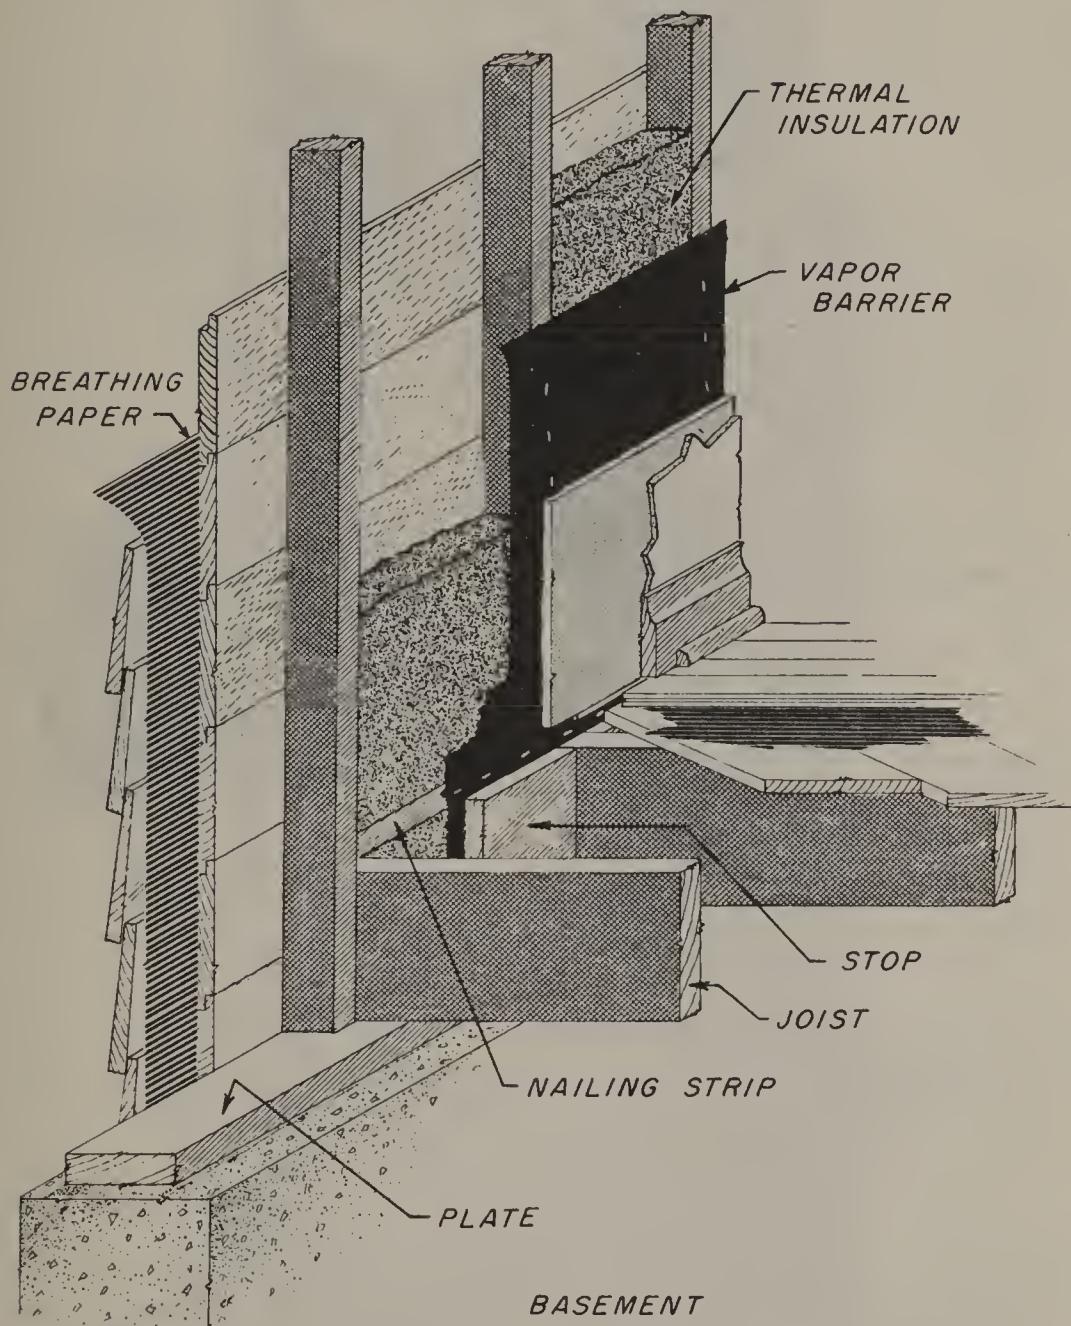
Side wall, first-floor level.* Condensation control in this detail is obtained by the use of a vapor barrier placed over the studs and extending down between the joists and stapled to a wood strip just at the line of the joist tops. A stop is necessary between the joists to support the insulation and the barrier. Since the paper covers supplied with batts are not long enough to be continuous over the height of the studs, they cannot be considered effective vapor barriers. The thermal insulation shown may be fill- or batt-type material extending below the floor line to the plate.
